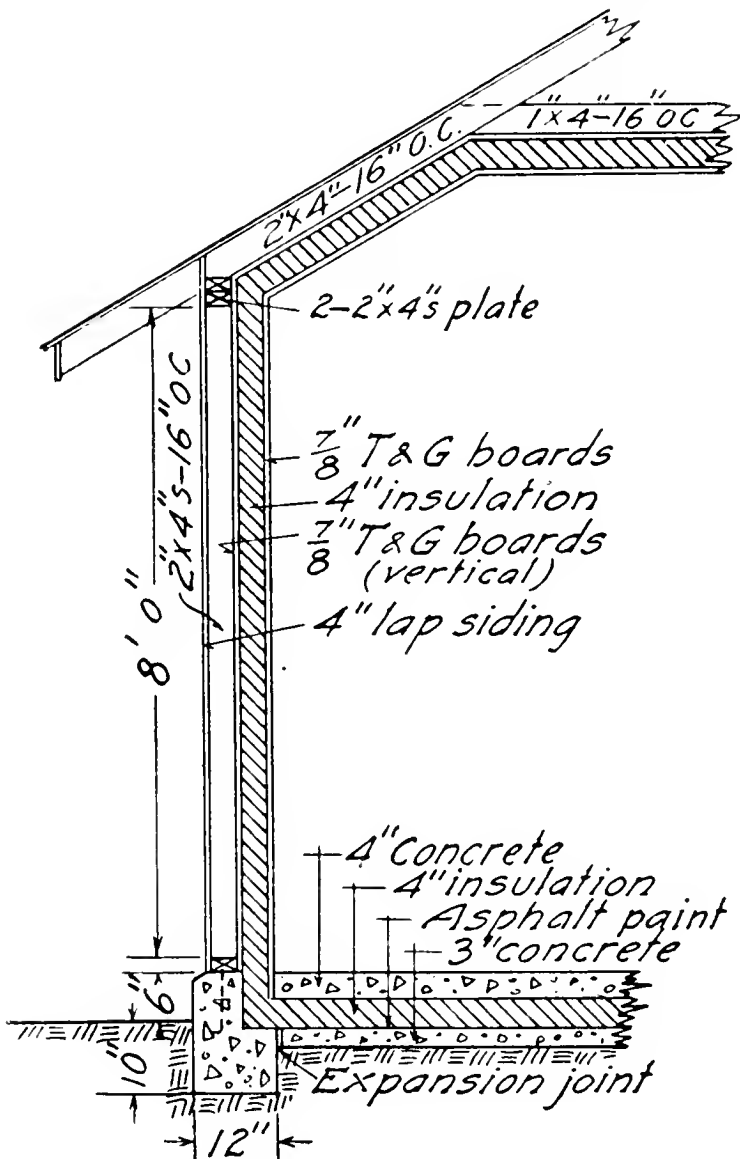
Cross section A-A of ice-storage room (shown in Fig. 282) to be used in connection with milk house
